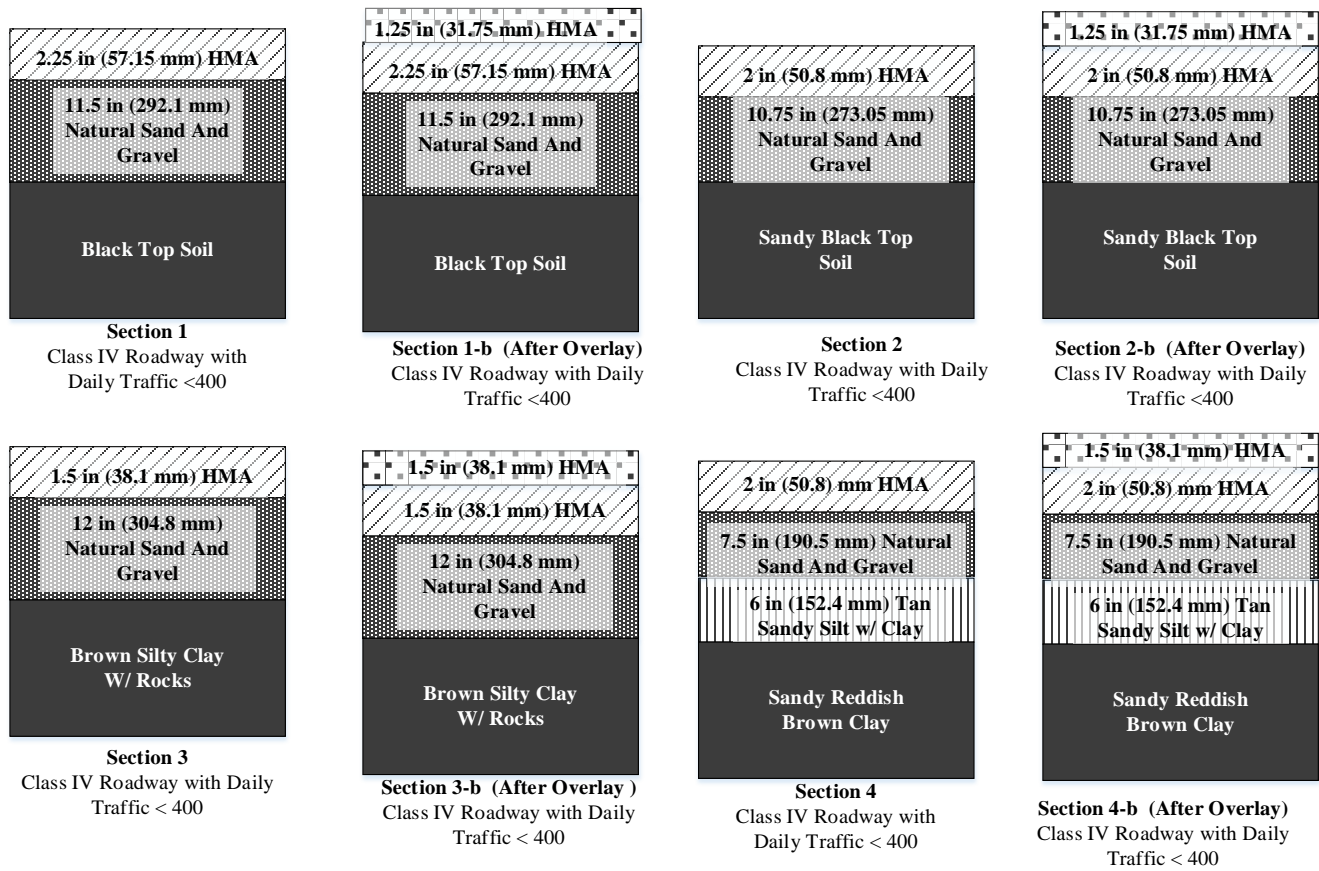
Layer configurations and traffic information for sections 1, 2, 3, and 4 in McHenry County, Illinois.
